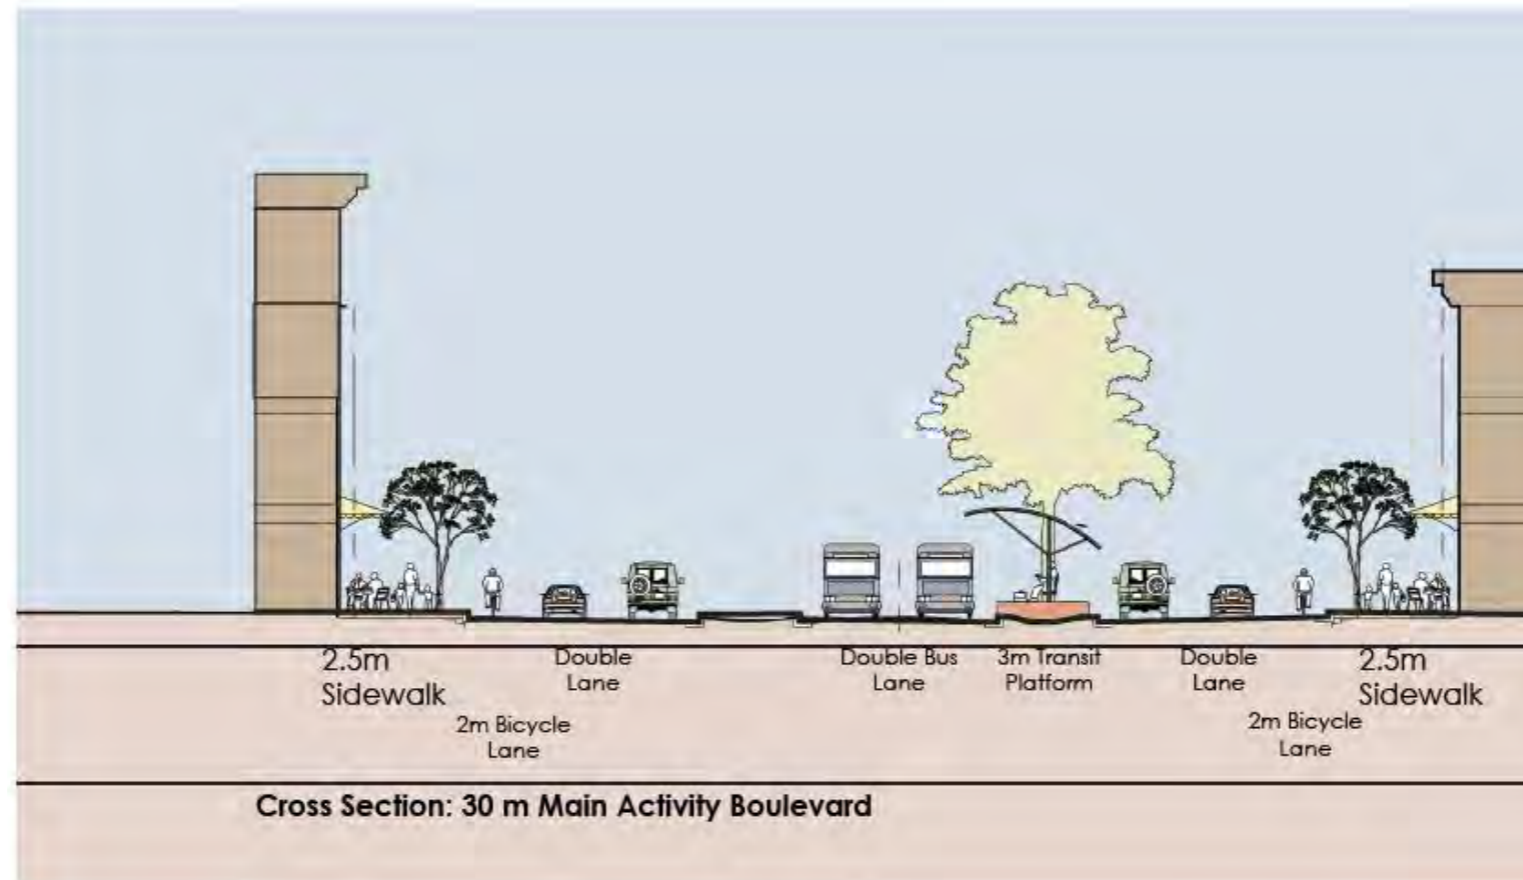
Proposed Road Sections (Source: Author, Adapted from Gunderson, 2012).
